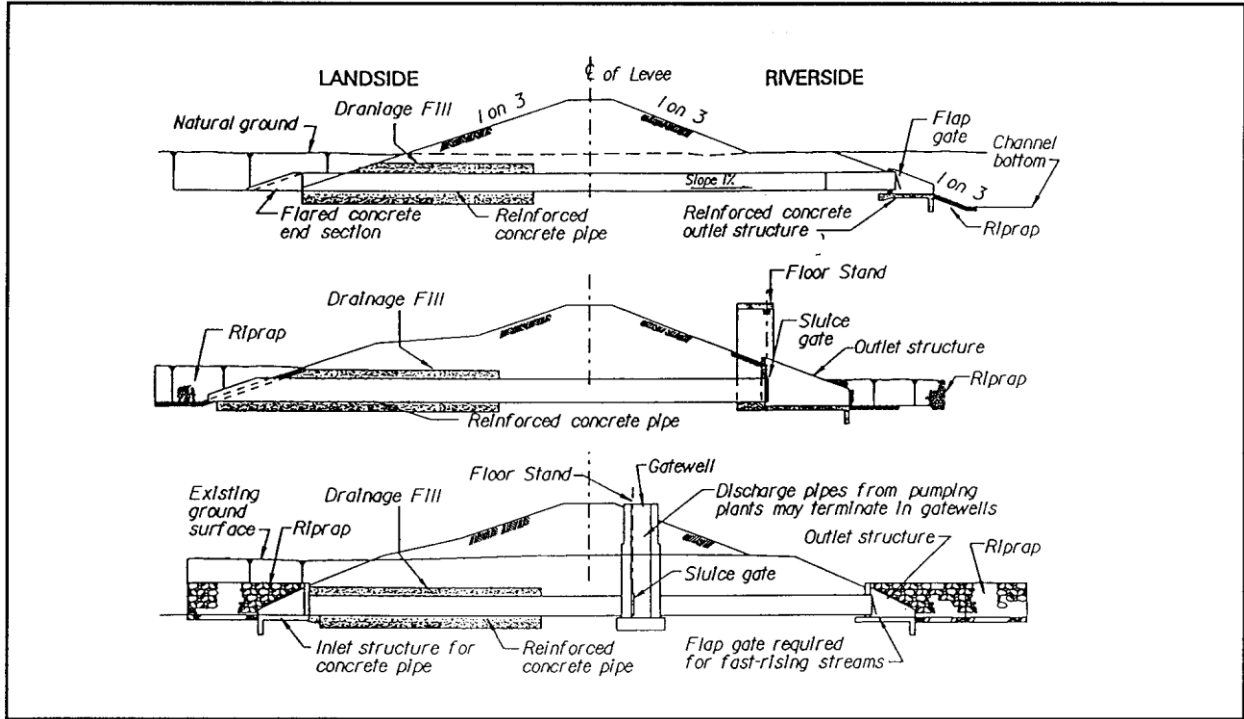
Typical Sections and Drainage Structures through Levees (Source: USACE, 2000)
